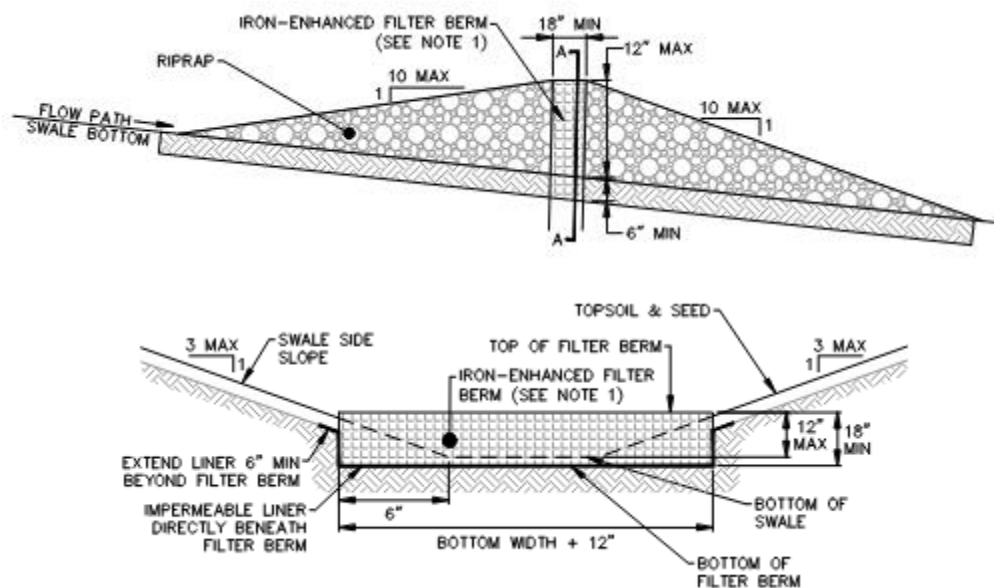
Profile view and cross-sectional view of an Iron-Enhanced Swale Check Dam
